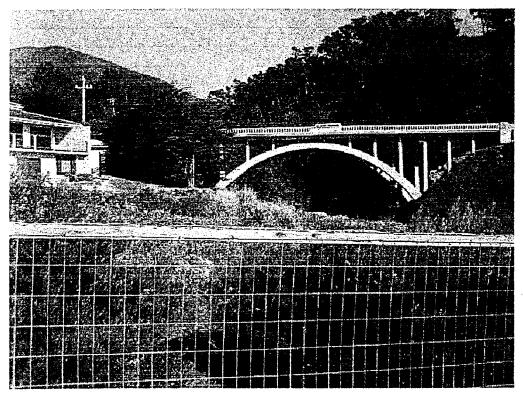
Photo of Highway One Bridge looking across Parcel APN 243-161-017 and 243-161-018.
